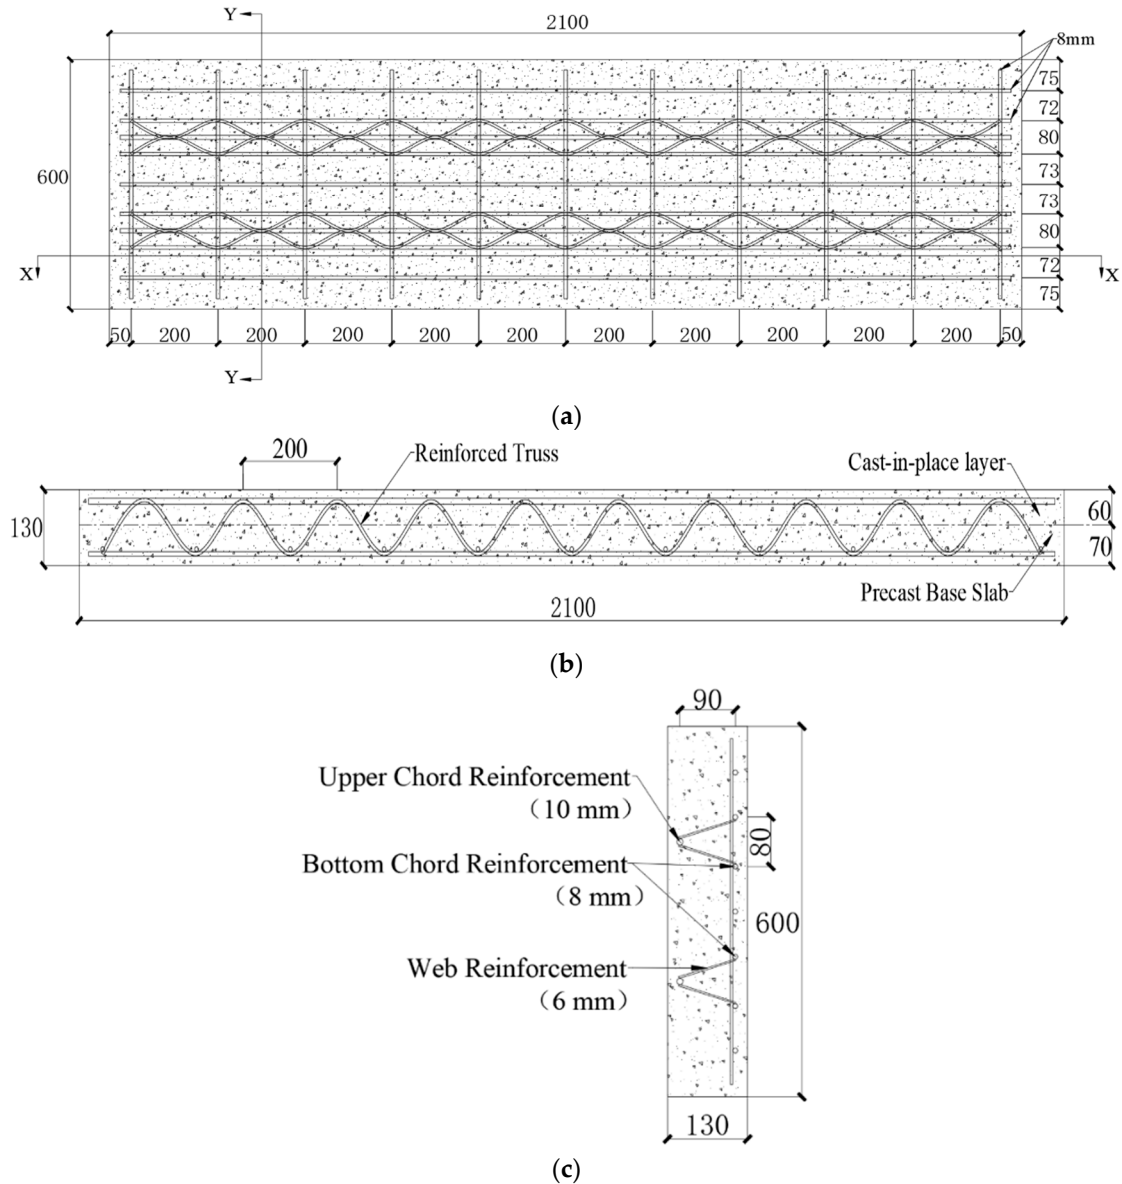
Details of the laminated slab. (a) The layout of reinforcement in the laminated slab; (b) Section X-X; (c) Section Y-Y.
